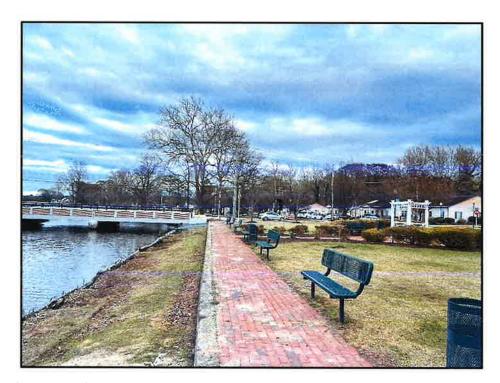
View along the existing bulkhead looking east/upstream toward Delaware Ave (January 2023).
